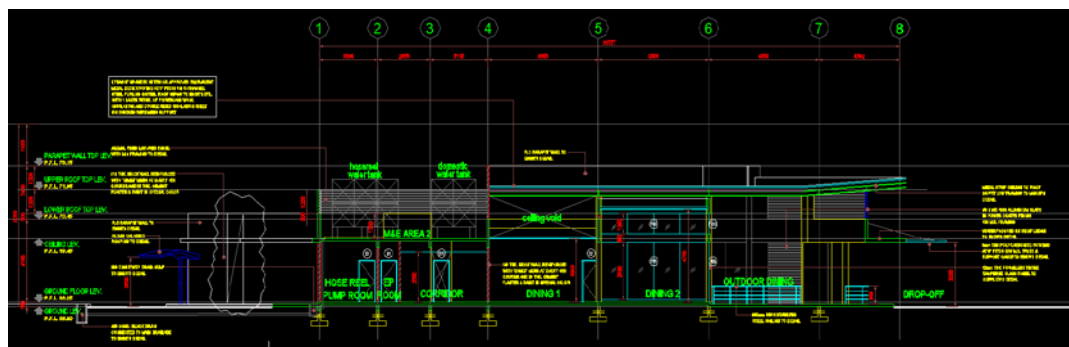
Floor Elevation of the New Non-residential restaurant.
